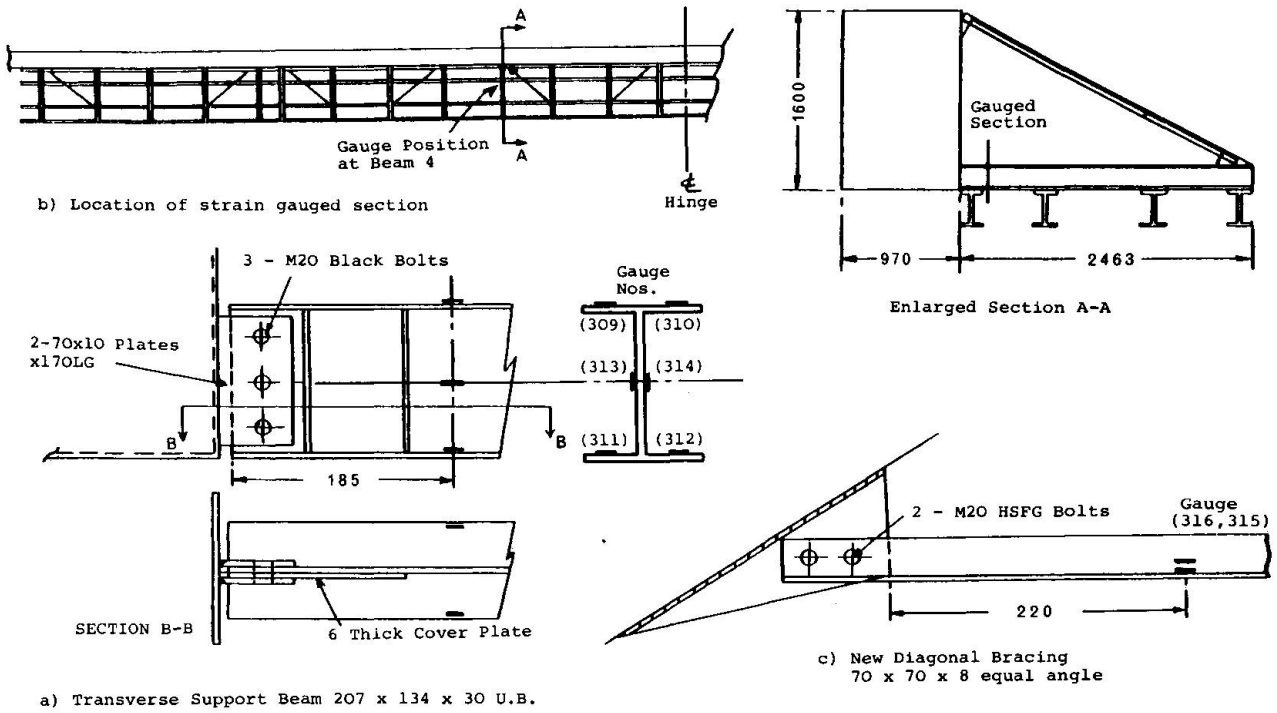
Details of Repaired Joint Structure and Strain Gauges.
